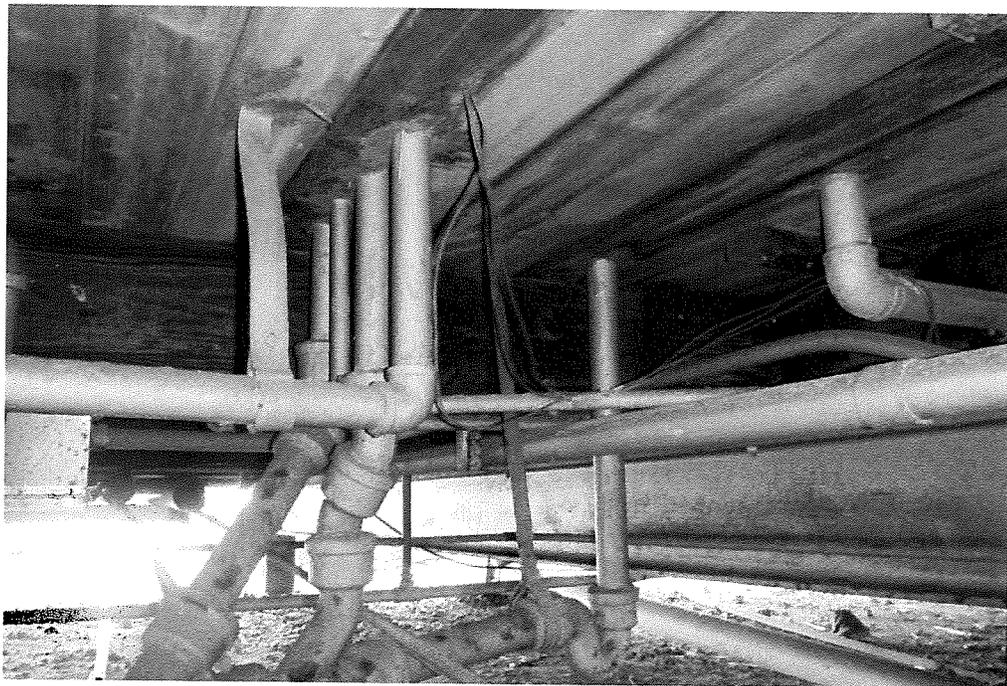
Location of Plank Stiffening (Repair per sheet S-9)
